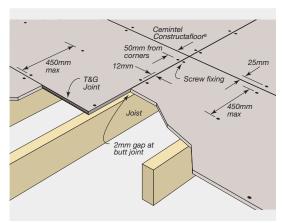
Constructafloor Fixing Detail -Screw Fixing
